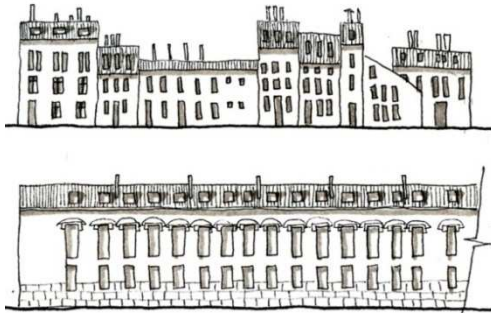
Typical street facade in Paris, before and after Hausmann's renovation[59]
